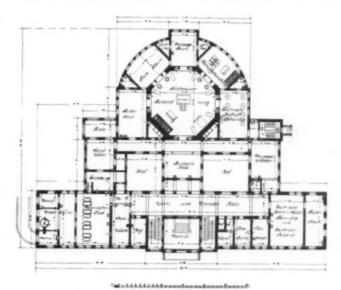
Central bath house, with hydrotherapeutic appliances—Floor plan.
